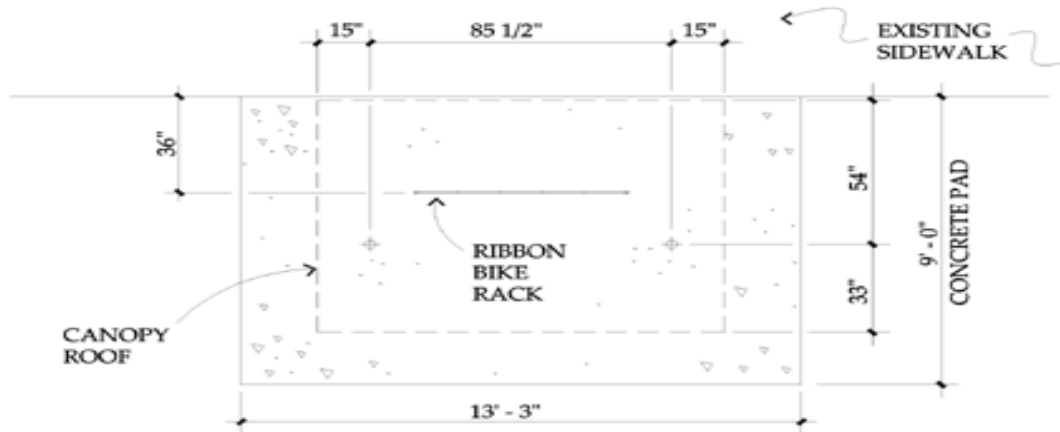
Kaleidoscope Centered Canopy and Ribbon Rack Installation Dimensions in Plan View.
